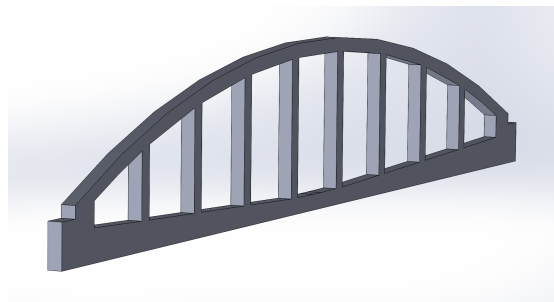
Reinforced concrete roof truss, modeled in CAD. Used to calculate concrete to air ratio.
